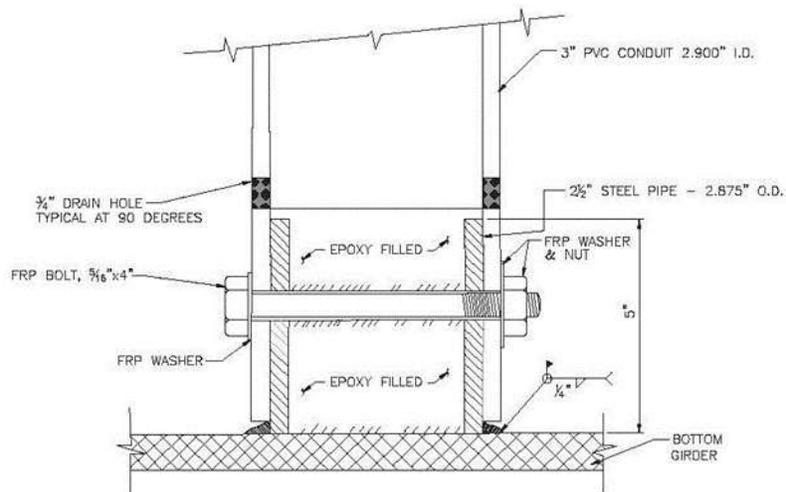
Anode Protection Pipe Bottom Girder Termination
